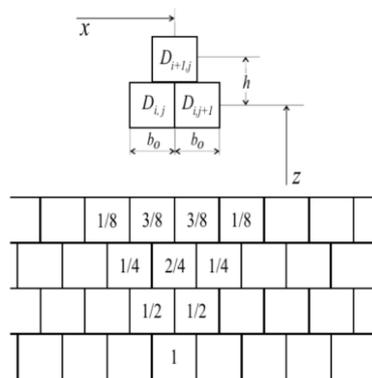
Symmetrically arranged elements in horizontal seams divided by cracks [3]
